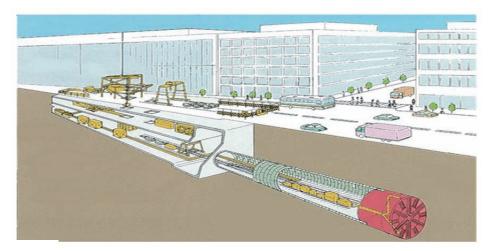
TBM (Tunnel Boring Machine) construction method between stations
